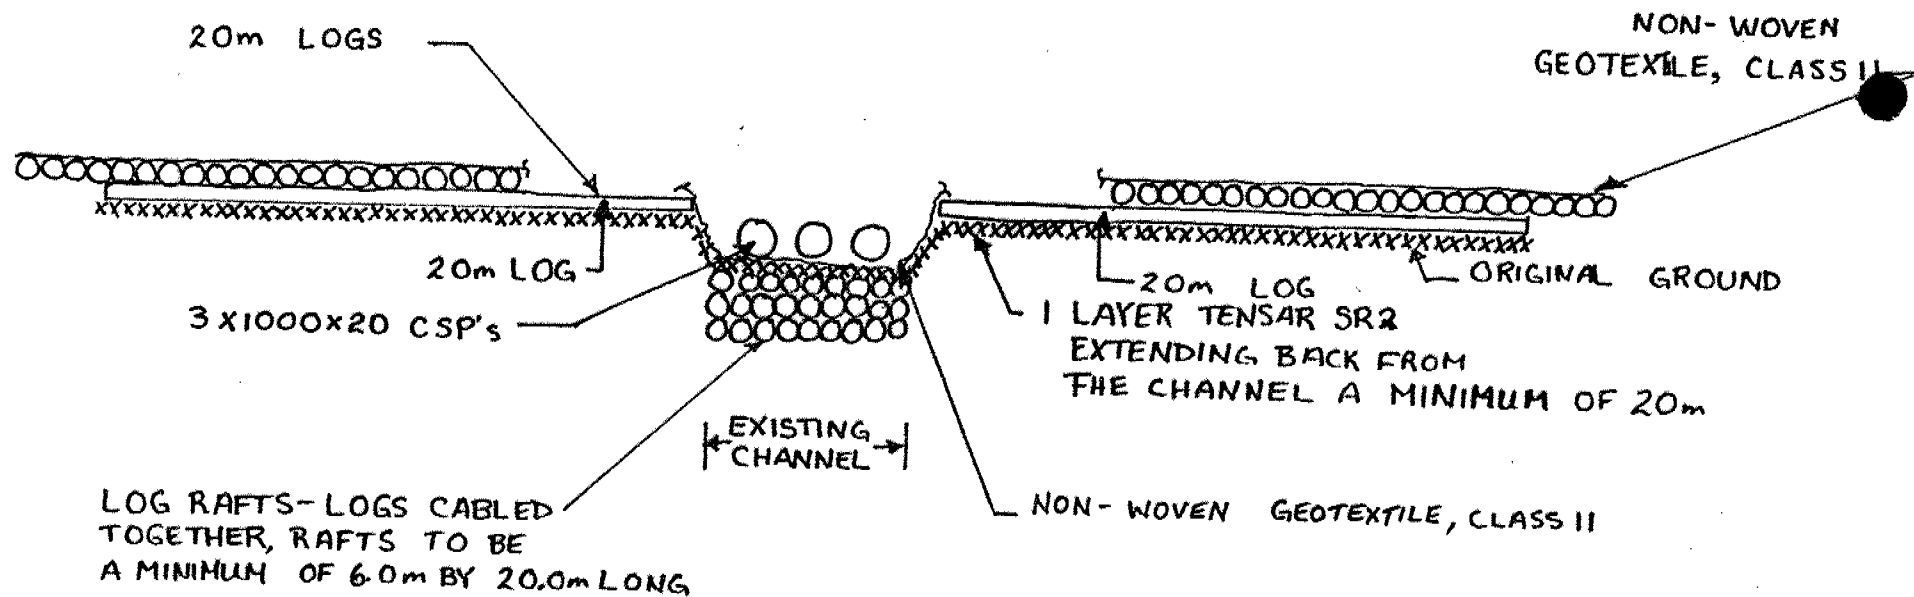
DETOUR CULVERT LOCATION (N.T.S.)
